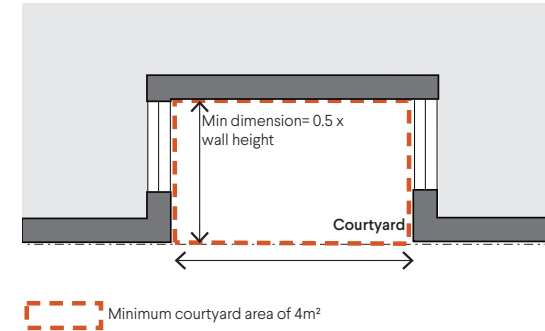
Courtyard minimum dimensions (multiple dwellings)
